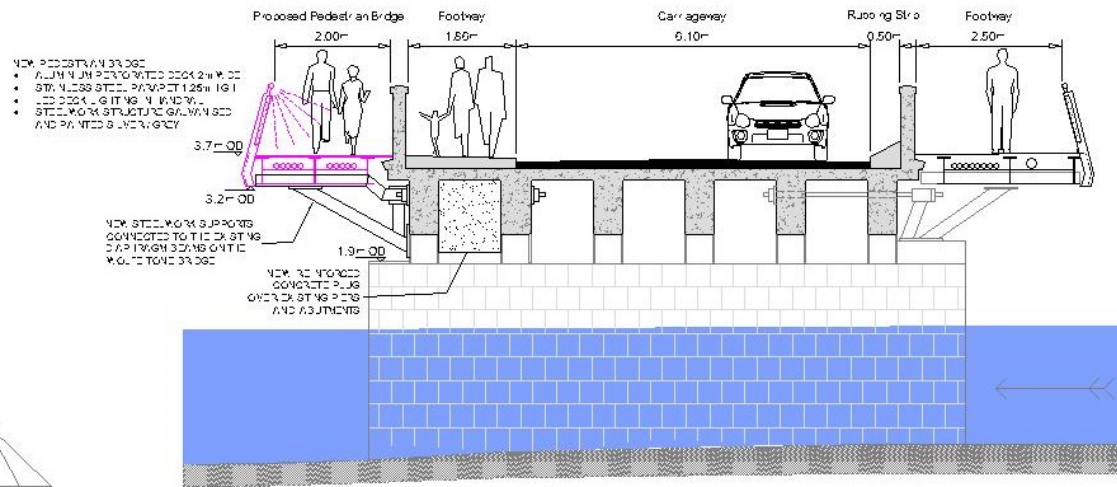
PROPOSED FOOTBRIDGE (PINK) LOCATED AT WOLFE TONE BRIDGE.
